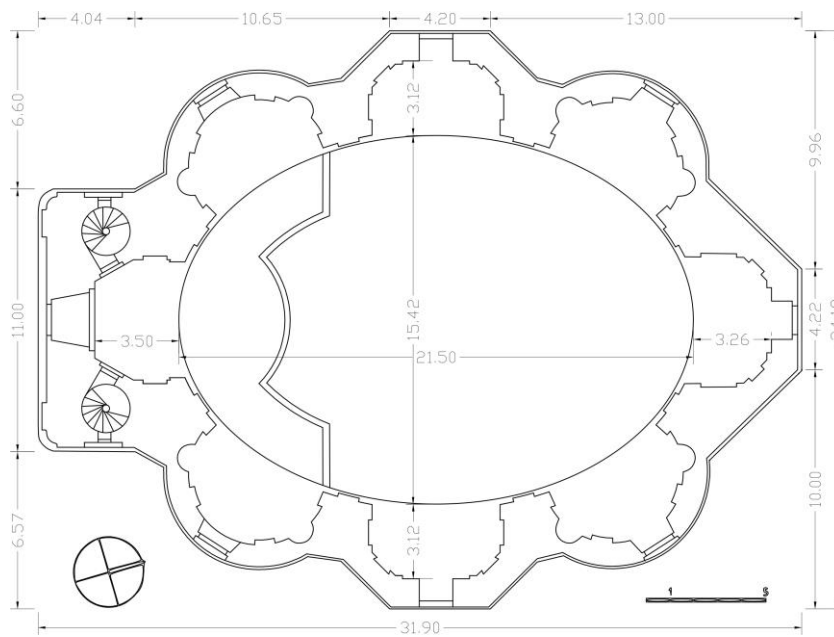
Floor Plan of St Barbara's church (All dimensions in meters)
